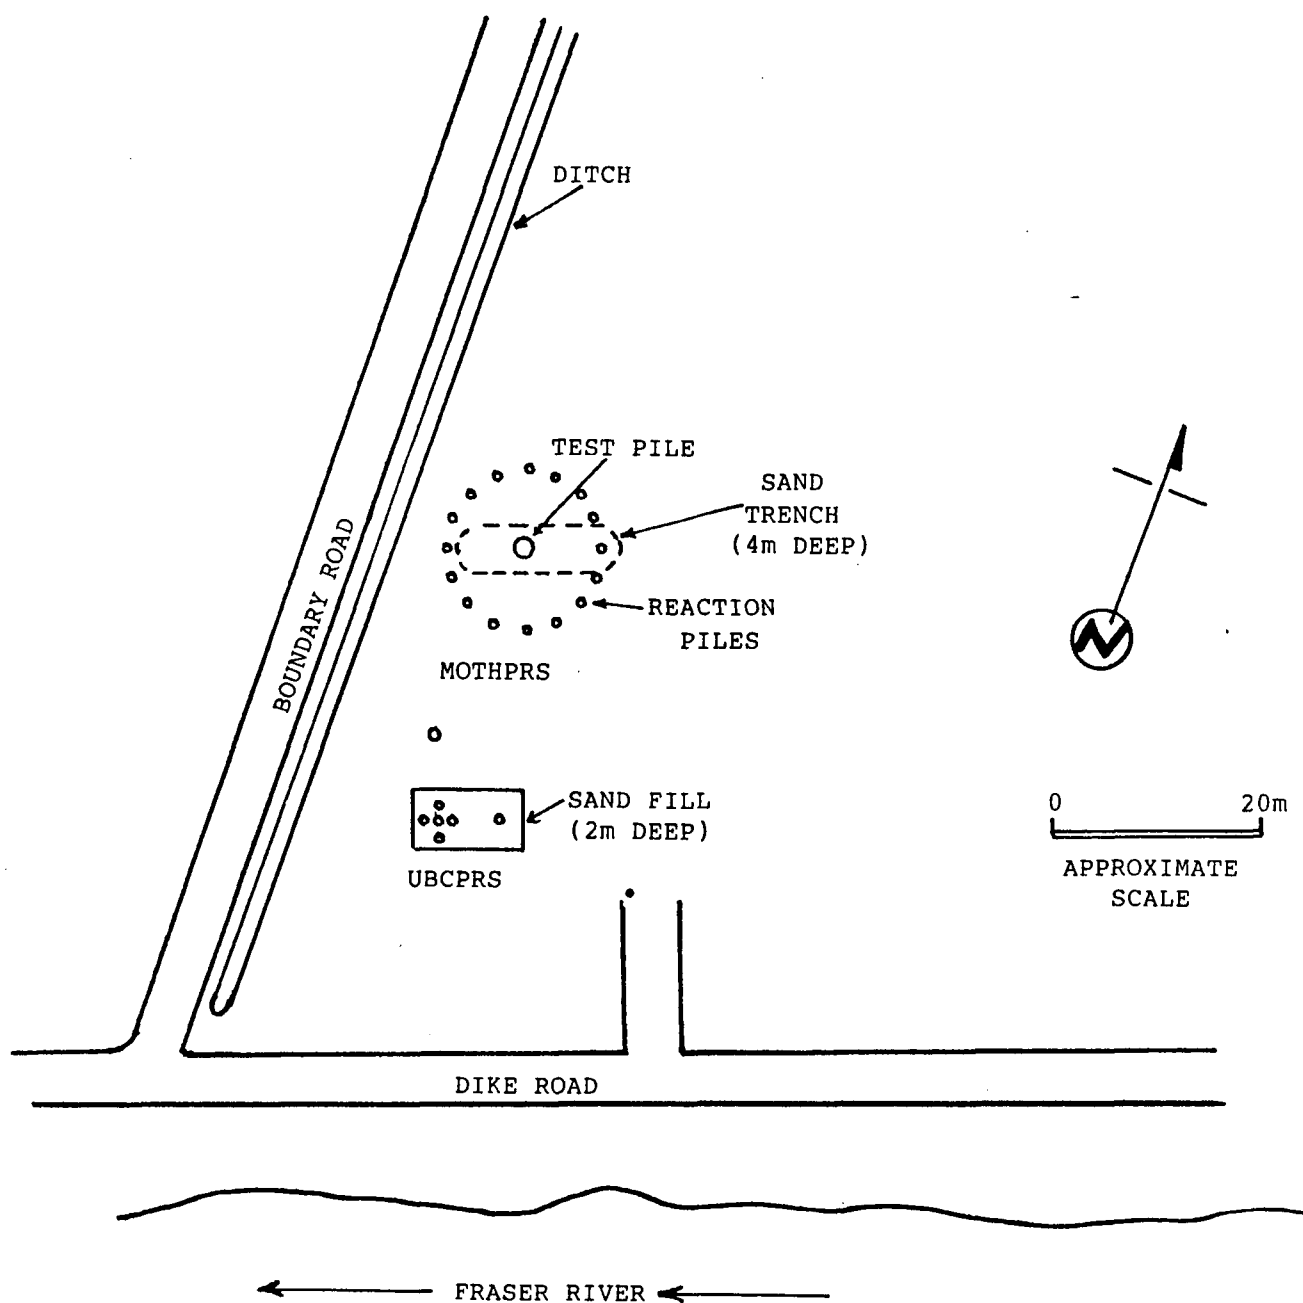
SITE PLAN OF THE UBCPRS
